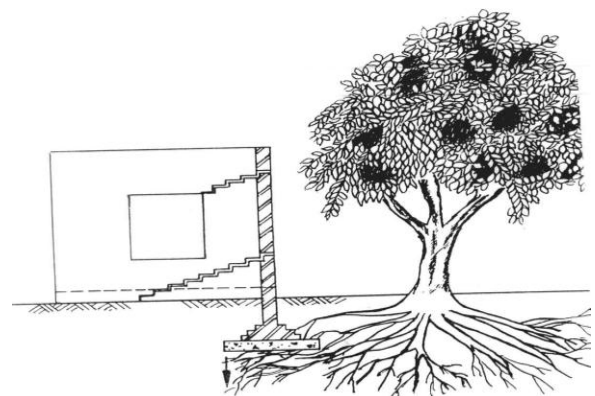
Trees growing close to building on shrinkable soil may cause cracks in the walls due to vegetation (Narrow at base and wide upward).
